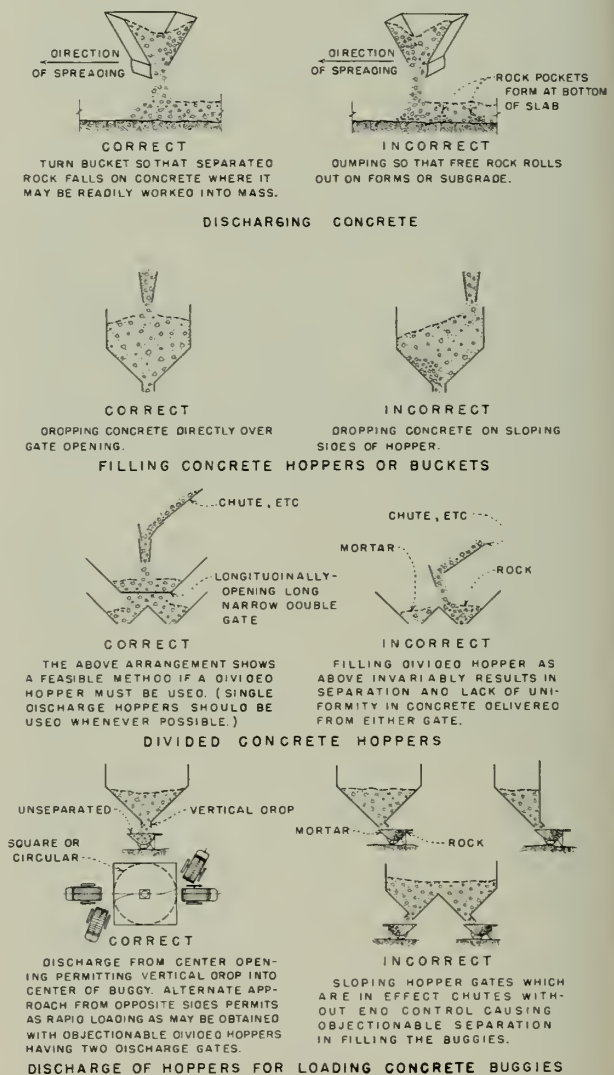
Methods of handling concrete with buckets, hoppers, and buggies.
